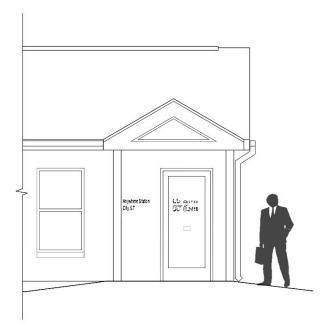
Typical elevation showing placement of Primary Signage and Facility / Station ID Plaque for CSF Small plans 40, 50, 65A, 80A, and 100A
